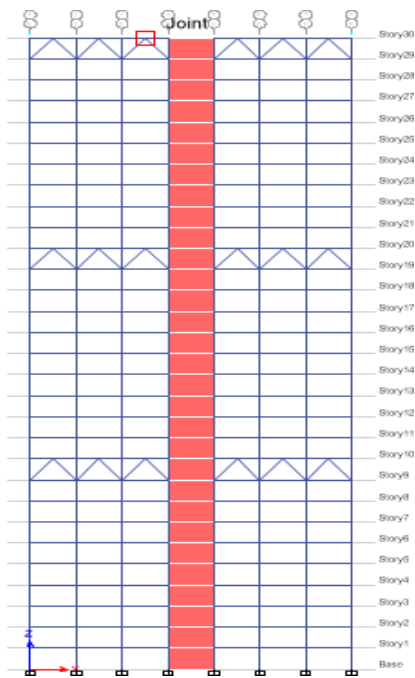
R.C.BUILDING SHEARWALL& OUTRIGGER AT 10 AND 20 STOREY
